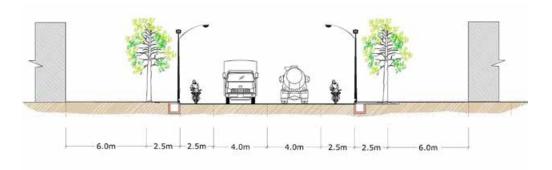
Cross section of proposed two lane roads Source : Sabaragamuwa Provincial Office, UDA, 2020
